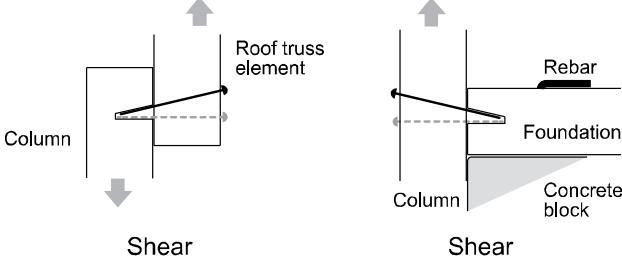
Failure modes at connections between roof structure and column (left), and between column and foundation (right).
